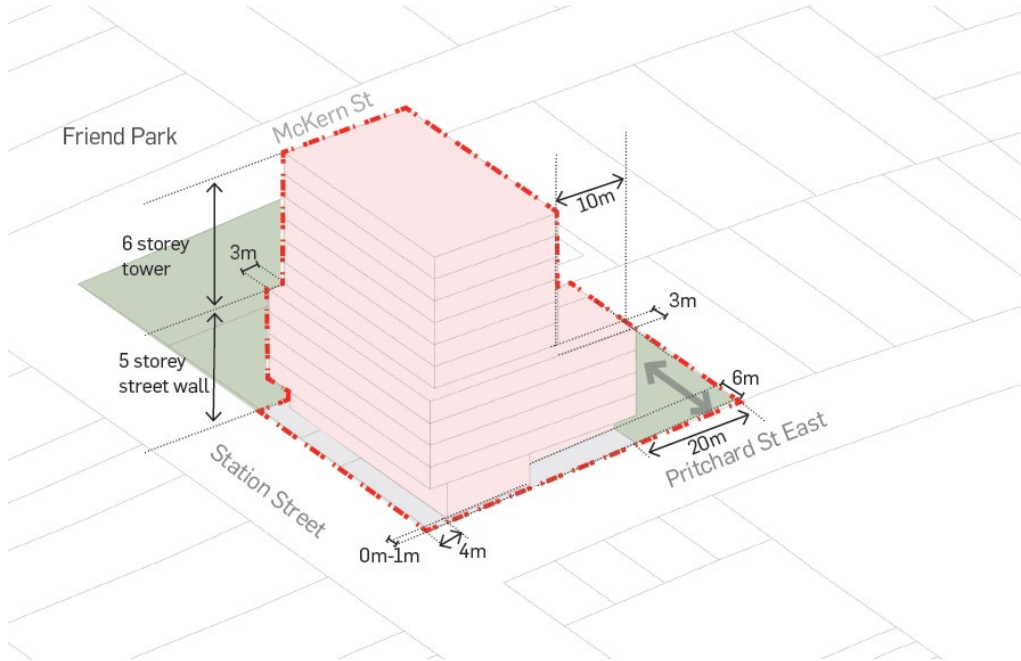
Corner of Pritchard Street and Station Street Precinct (3D Conceptual Diagram north – south section)
